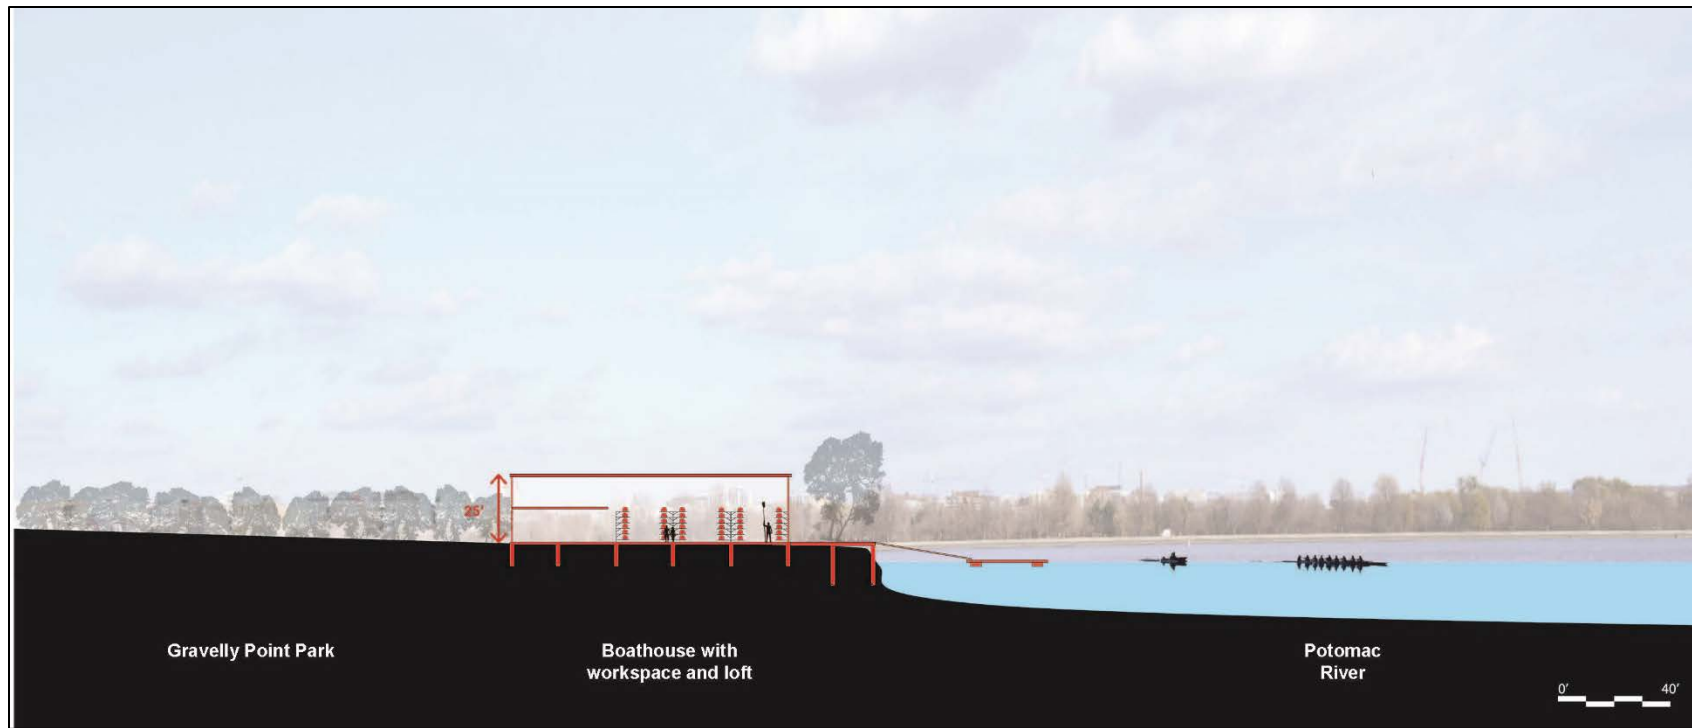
CONCEPTUAL ELEVATION AT THE GRAVELLY POINT SITE
